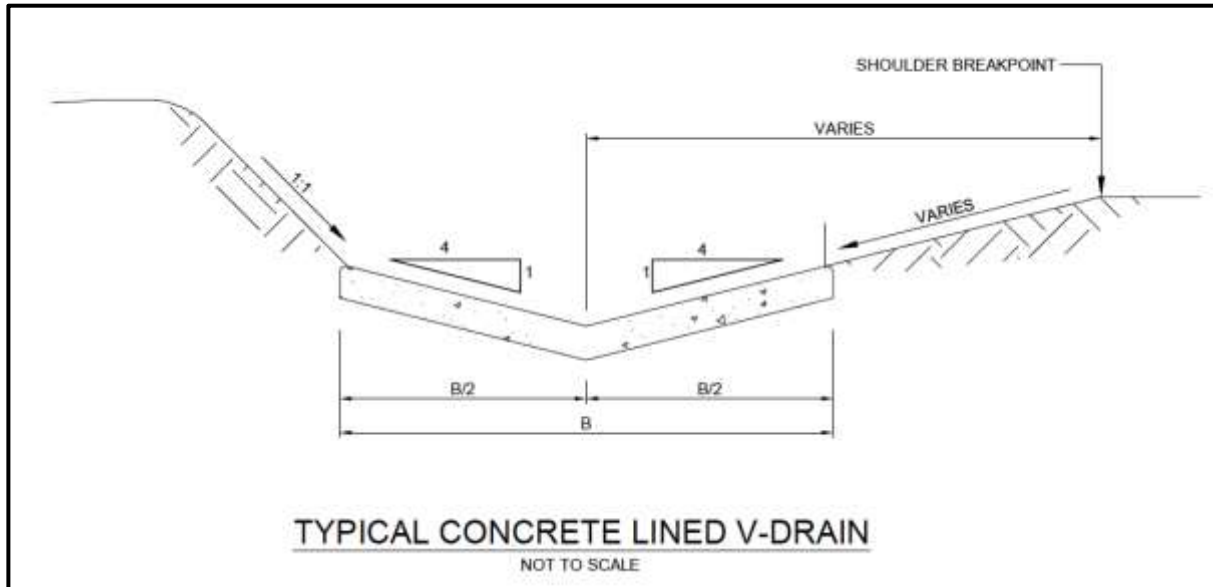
Typical concrete lined V-drain (WSP, 2015)
